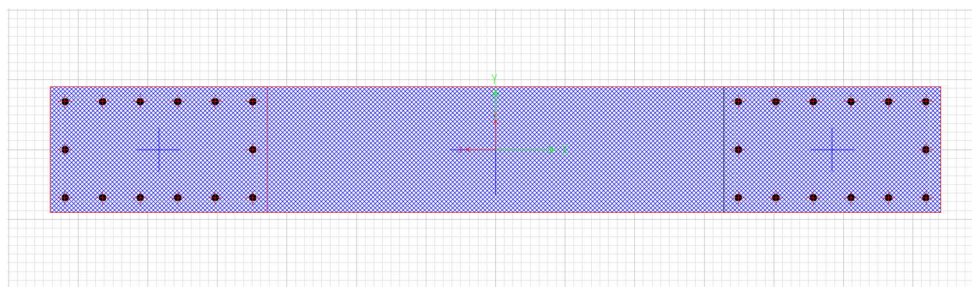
Typical cross sections of concrete walls in SAP2000 Section Designer
